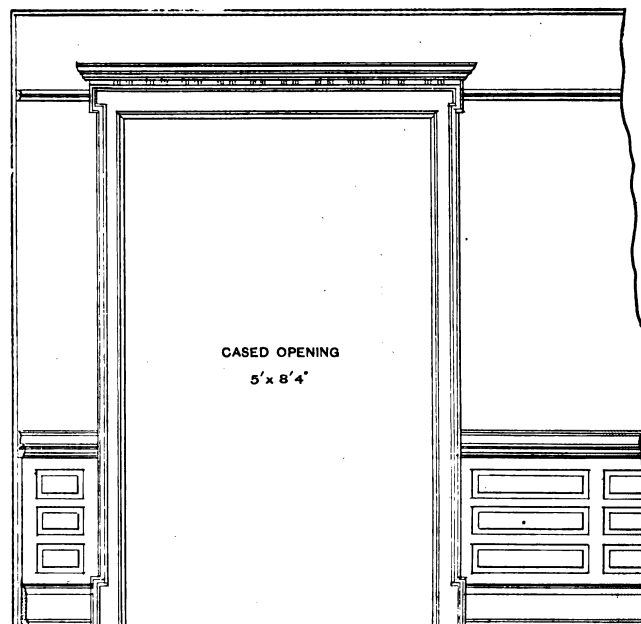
Elevation Showing Dining Room Finish.—Scale, 1/4 Inch to the Foot.
